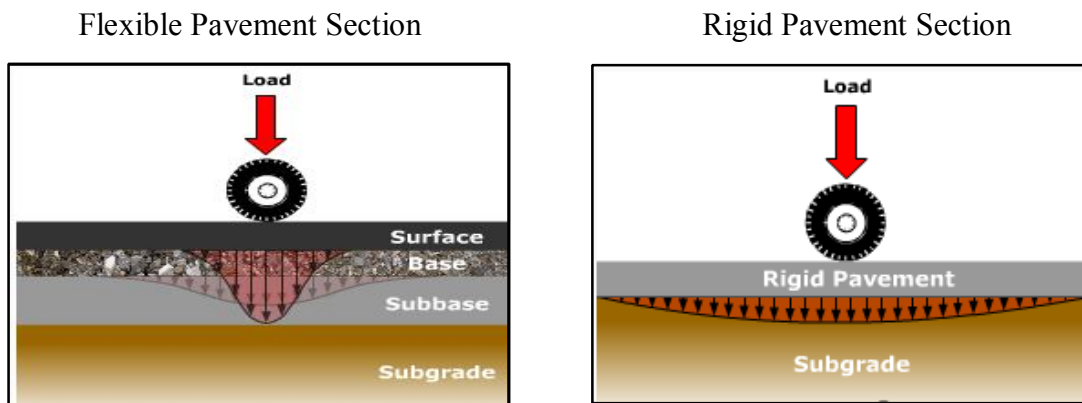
Typical stress distribution under a rigid and a flexible pavement.
